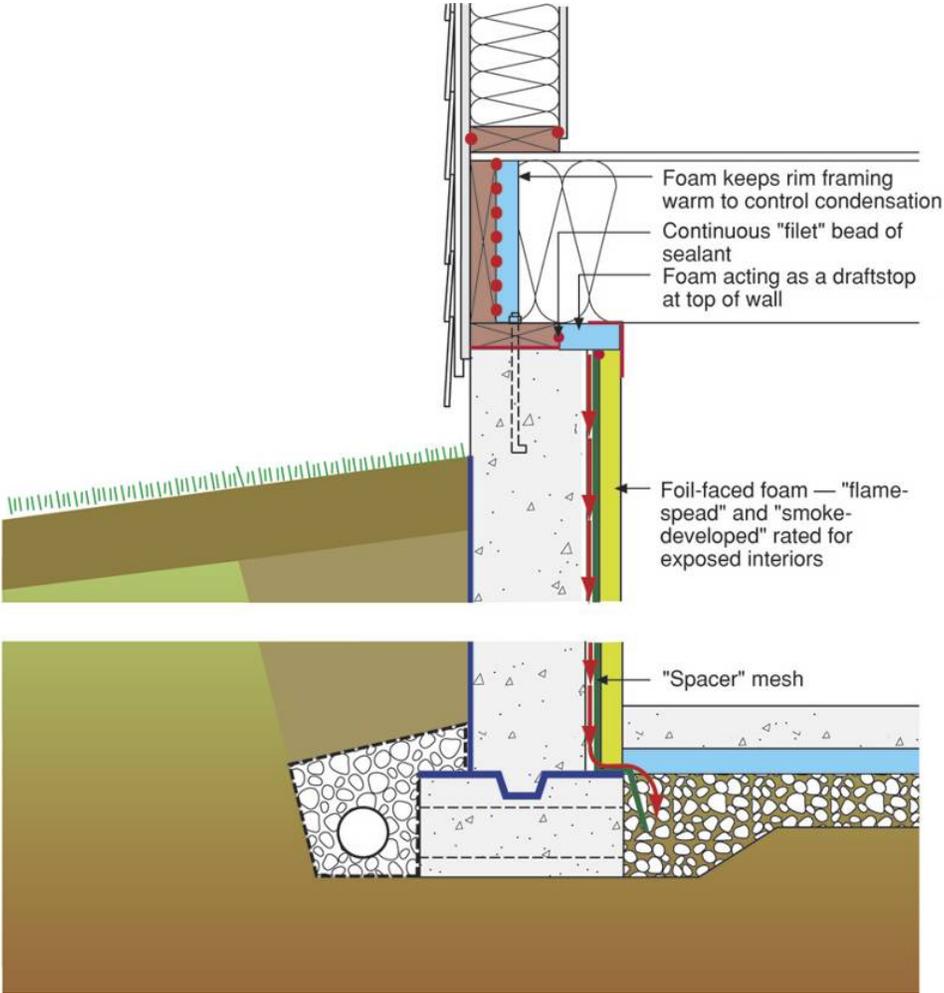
Interior drainage; new or retrofit construction (non-rubble walls)
